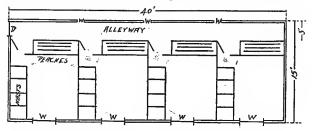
GROUND PLAN OF HOUSE WITH ALLEYWAY.
